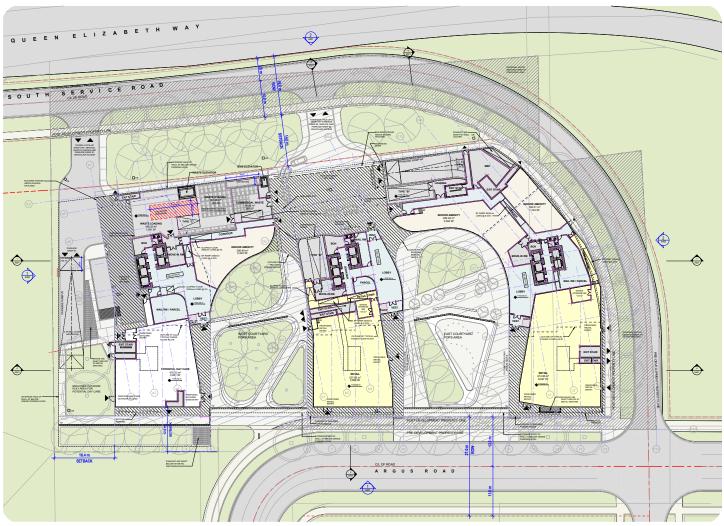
Ground Floor Plan (Prepared by Teeple Architects)
